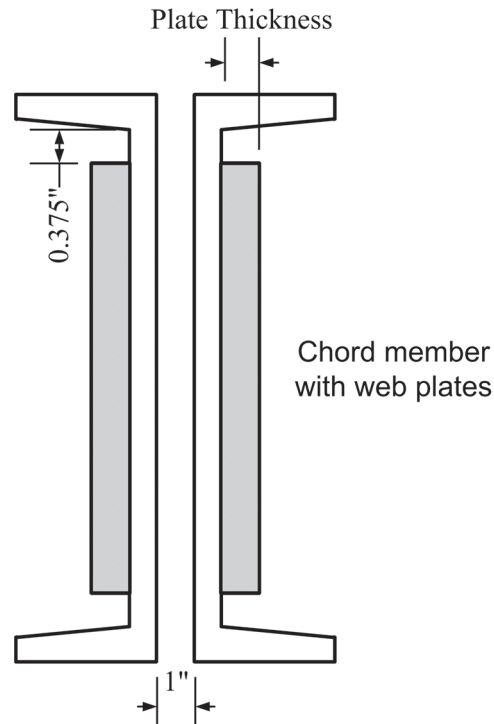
Design special segment and truss member sections for the nine-story ordinary STMF.
